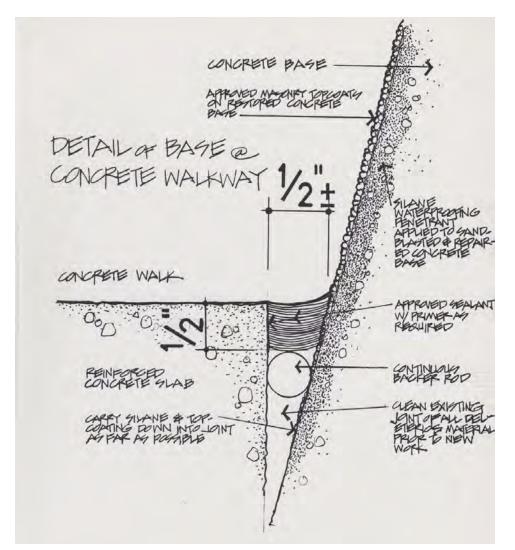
1986 Construction Detail at Base at Concrete Walkway. Eberson and Toto, Detail 2/5.
